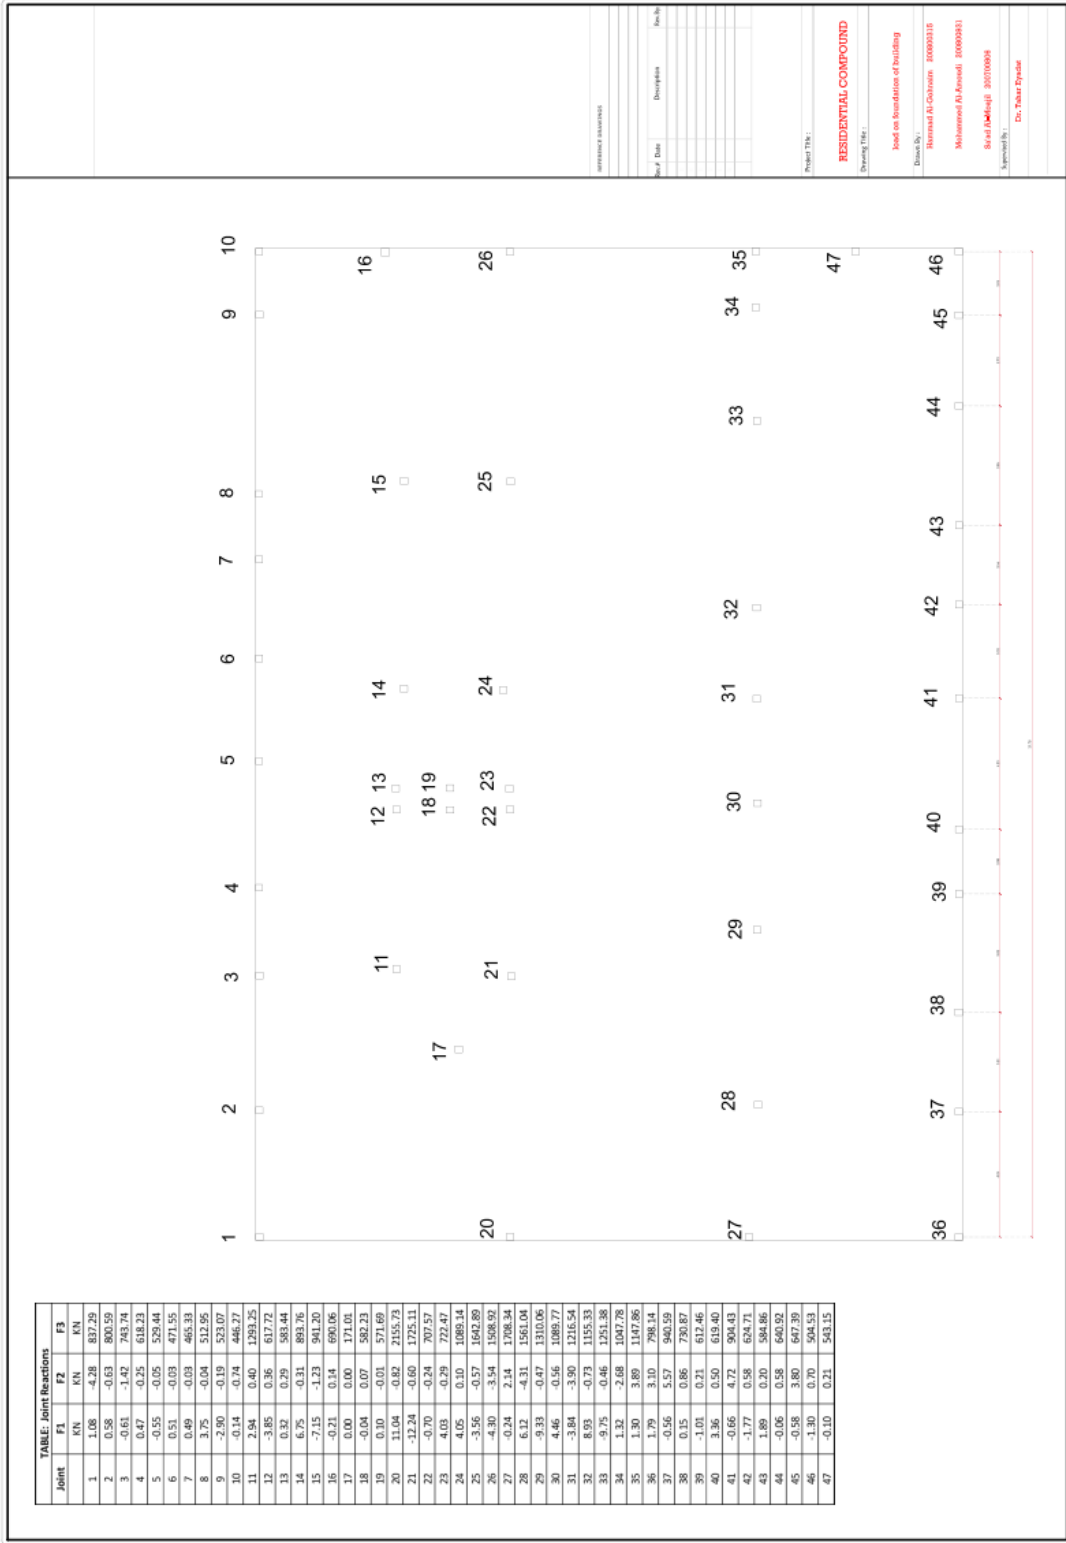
Plan of columns' repartition on the raft foundation (calculated forces).
